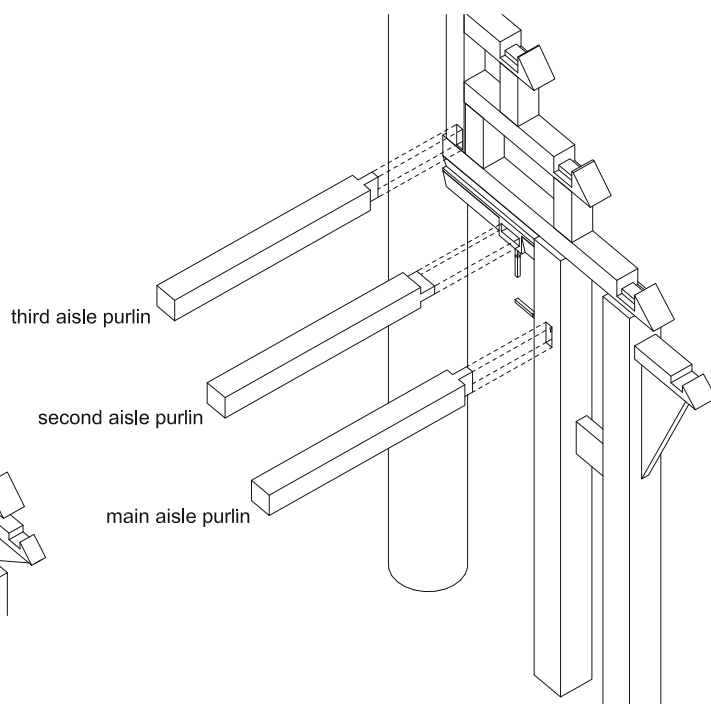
Purlins from the first bay meeting the second transverse frame in aisle roof
